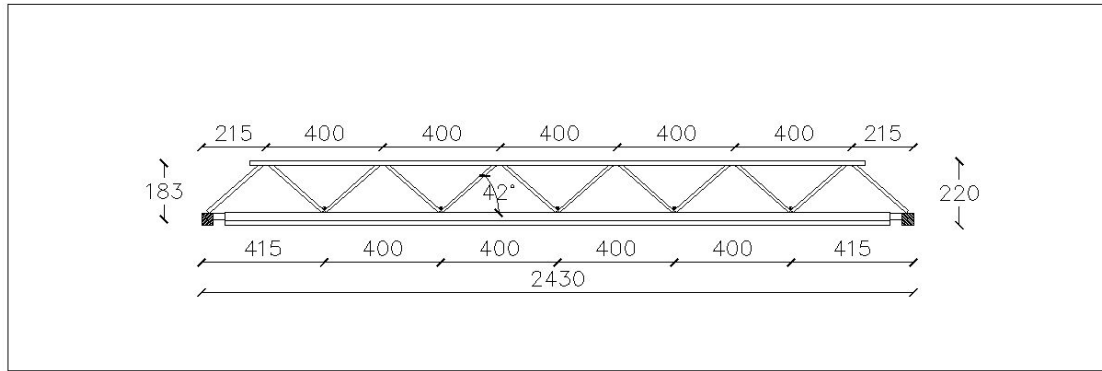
ECOTRAVE® RAFTILE® truss profile of beams 103
